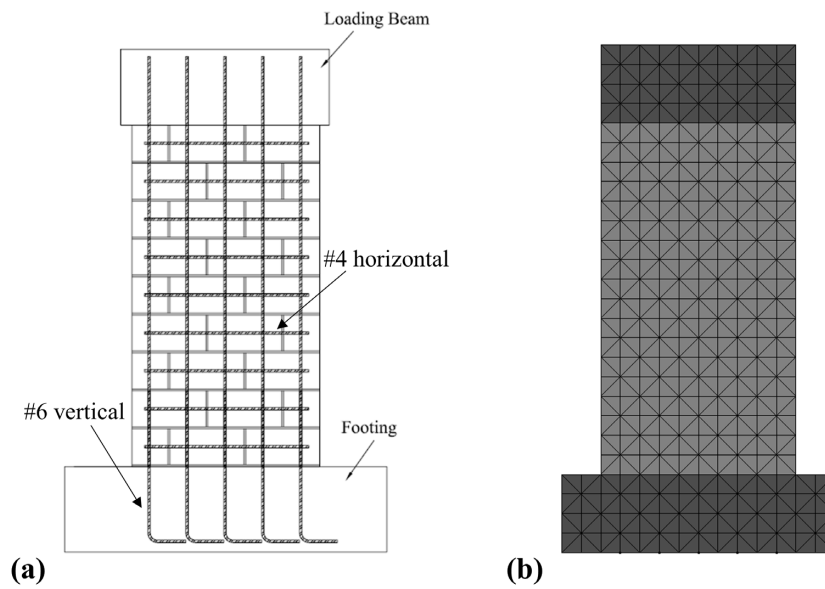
Reinforced masonry wall tested by Sherman (2011); (a) wall layout; (b) finite-element model using only smeared-crack shell elements.
